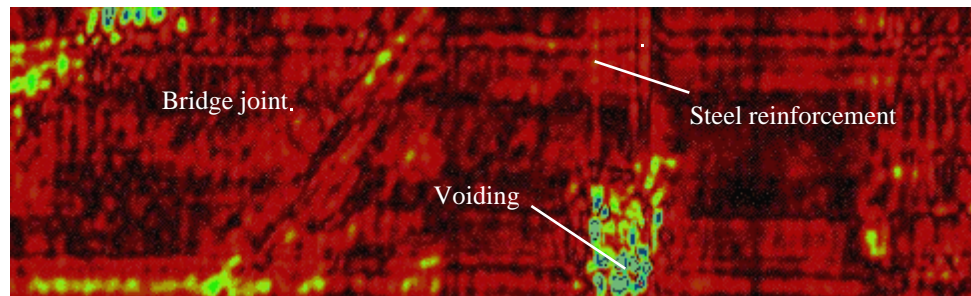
Reconstructed PERES data showing a horizontal plane through the reinforced concrete deck.
